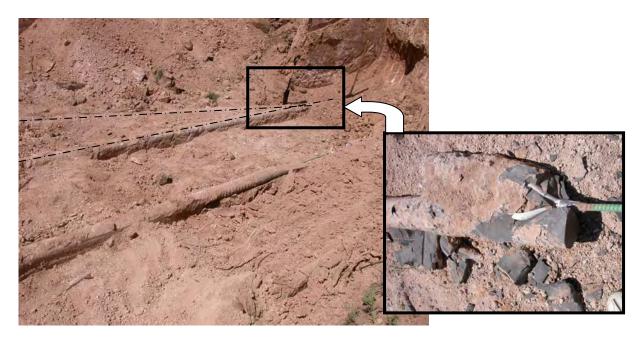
Nail #27 and Nail #28 Join Each Other at 18ft 4in
